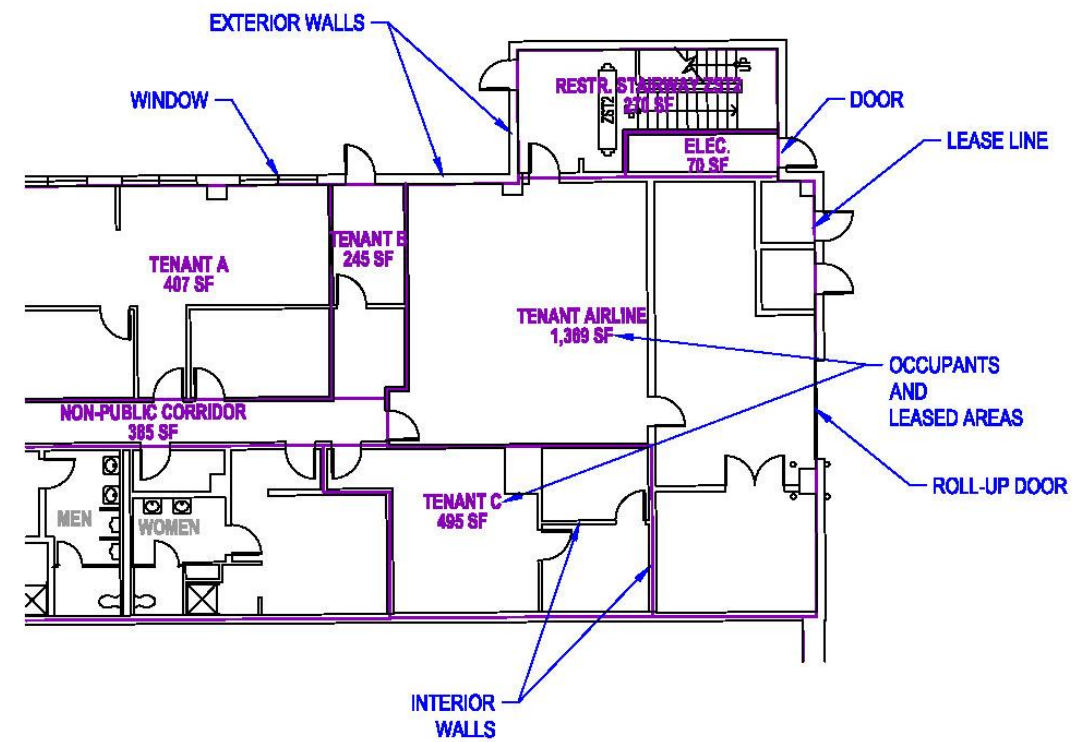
Typical Interior Space Conditions (Plan View)
